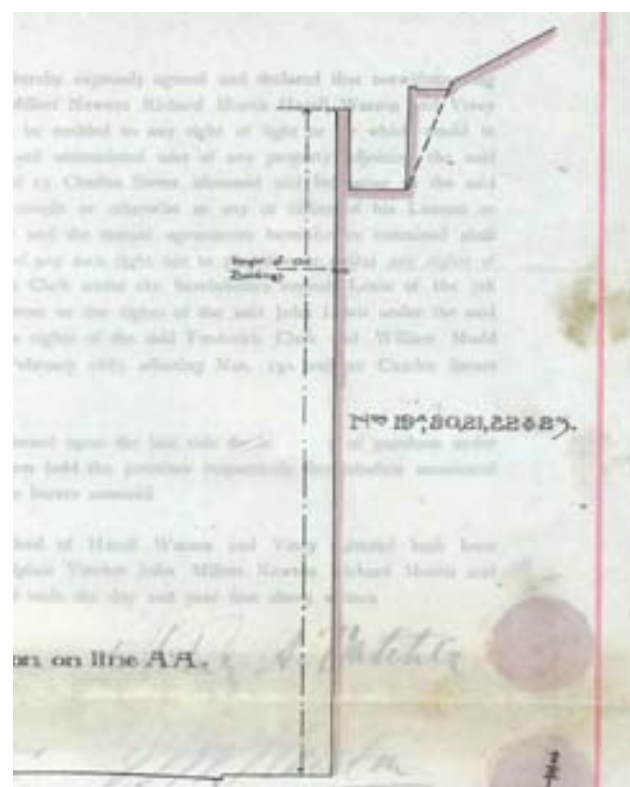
W. Ernest Hazel, Section of Charles Street, 1900.
